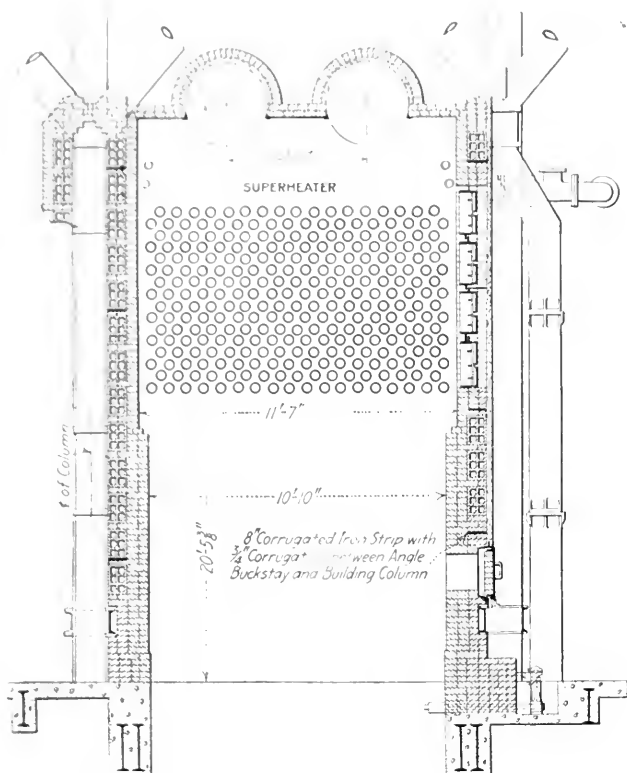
WALL CONSTRUCTION OF BOILER SETTING
